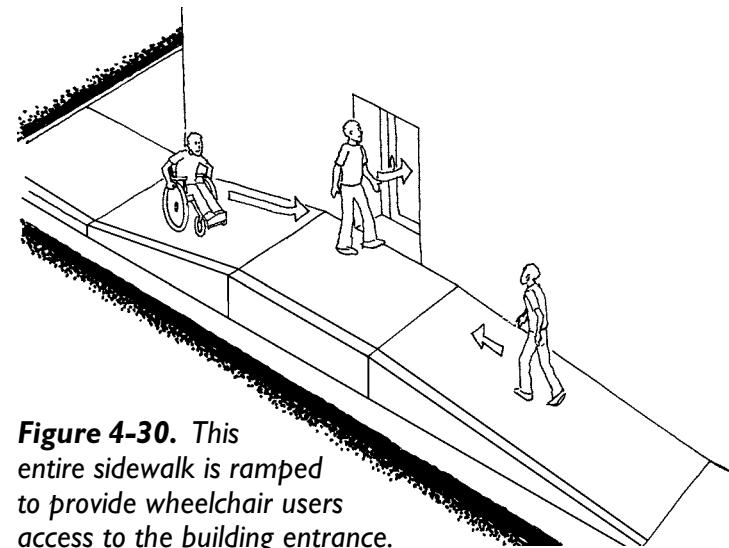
This entire sidewalk is ramped to provide wheelchair users access to the building entrance.
